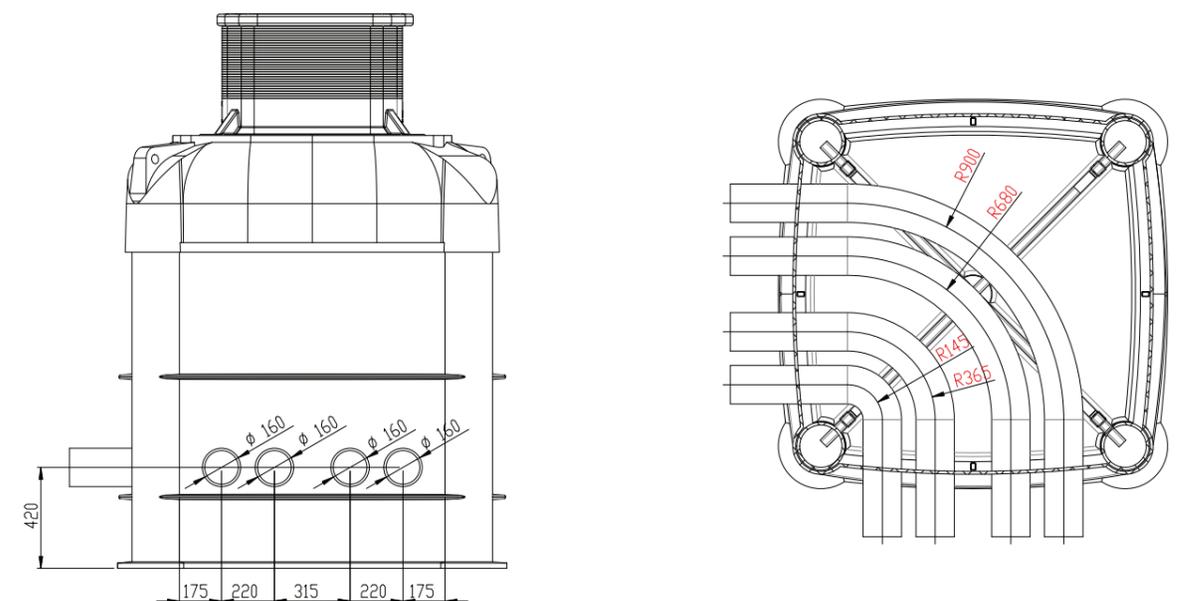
Transient PE Cable Chamber with fracture of the pipe route fi 160
